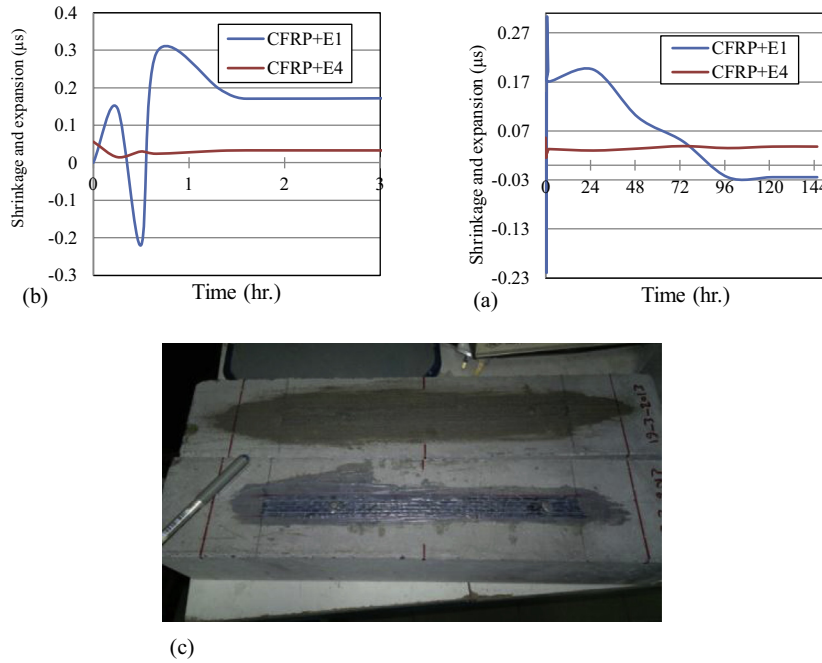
Shrinkage of concrete prisms strengthening by CFRP. (a) 0–144 h. (b) 0–3 h. (c) Photo of prism after fixing demec points.
